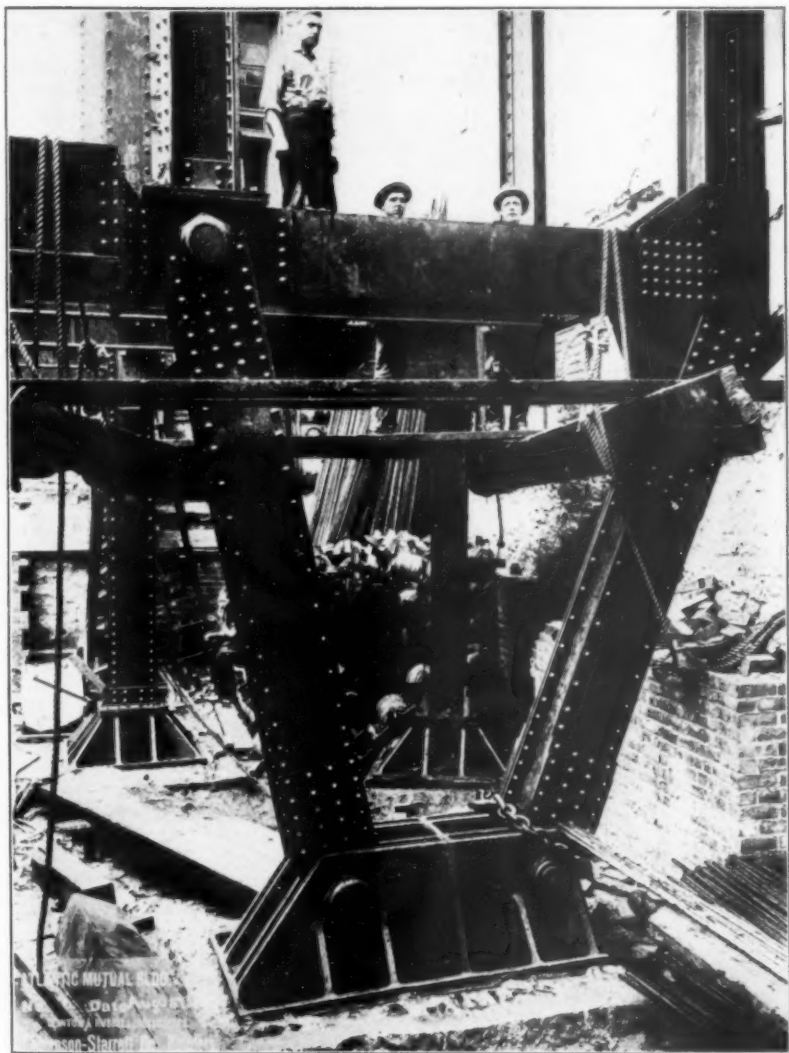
METHOD OF SUPPORTING COLUMNS IN SIDE WALLS (CANTILEVER FOR TWO COLUMNS), 18-STORY ATLANTIC MUTUAL BUILDING, NEW YORK CITY.
